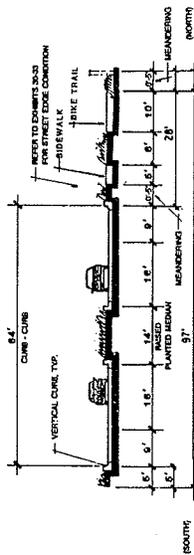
Circulation Plan, Ritter Ranch Specific Plan
